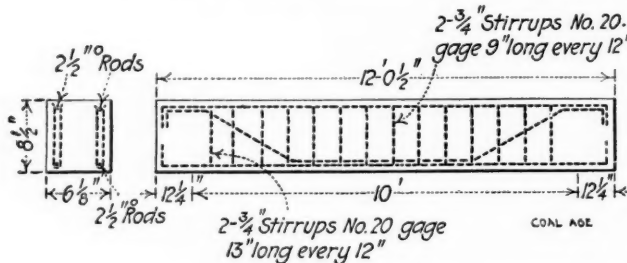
DESIGN OF A BEAM TESTED TO DESTRUCTION
